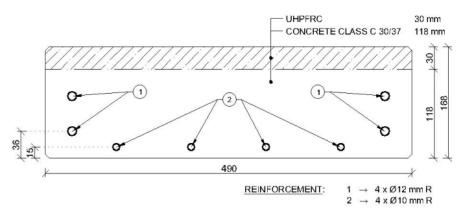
Typical cross section through the panel strengthened with a 30 mm UHPFRC layer
